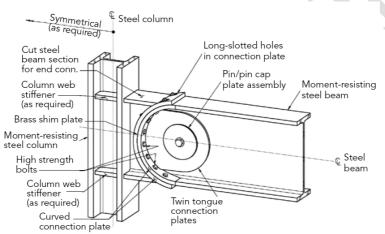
Structural details of Pin-Fuse connection [Cordova and Hamburger, 2011]
